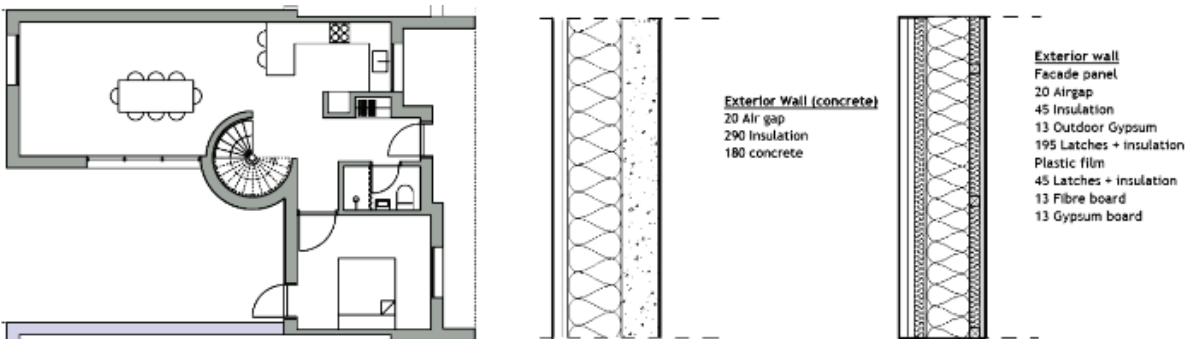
Left: Floor plan (two stories). Middle: Exterior wall in concrete. Left: Exterior wall in light timber
